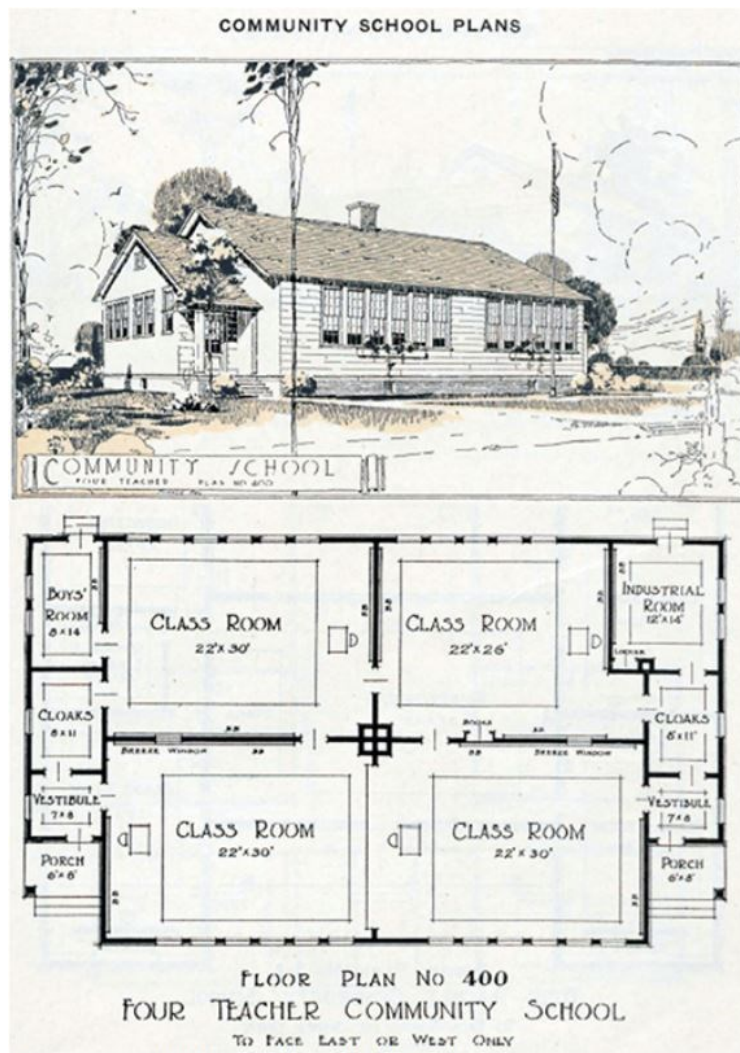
Standardized floor plan for a “Four Teacher Community School” (Floor Plan No. 400). The plan shows four classrooms, an Industrial Room for vocational training, and cloakrooms. Each classroom corresponds to one teacher—the basis for our Rosenwald teacher measure. Plans specified that schools “face East or West only” to maximize natural lighting. *Image courtesy of the State Archives of North Carolina.
